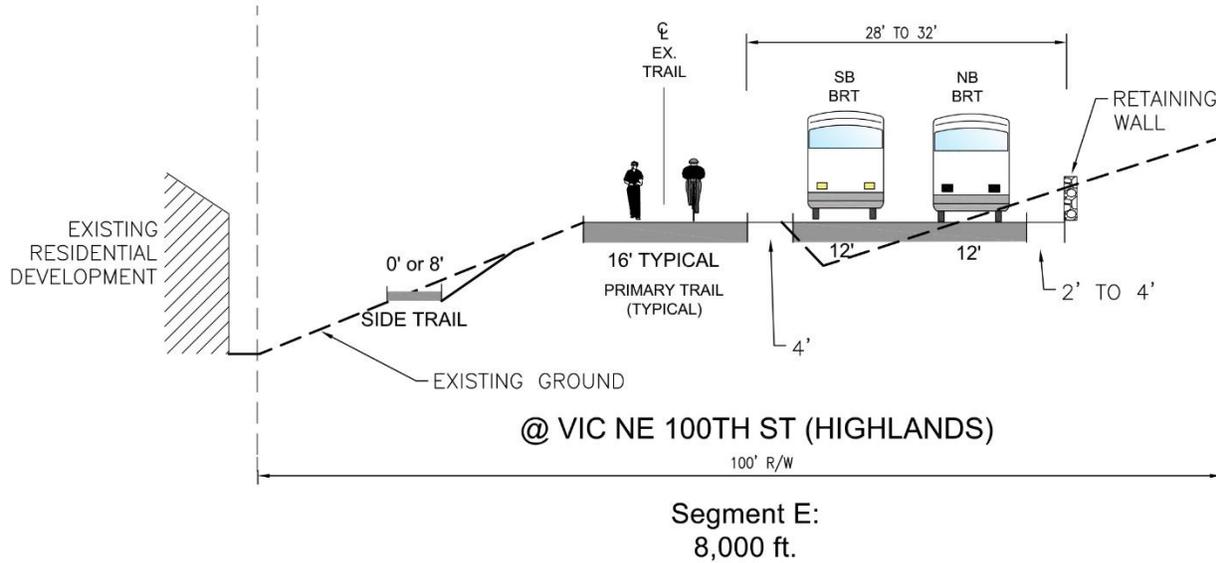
Typical cross section for NE 85th Street to 116th Avenue NE segment
